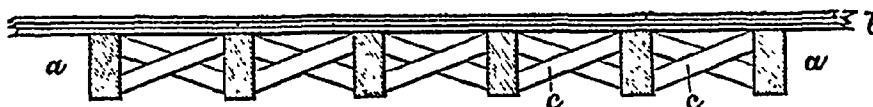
is a section through a single-joisted floor for a room 12 feet wide. a, a are the joists (6" x 3") placed 12 inches apart from centre to centre; b is a floor board in longitudinal section $1\frac{1}{2}$ inches thick; c, c are herring-bone struts 2 inches square. Scale = $\frac{1}{20}$.
